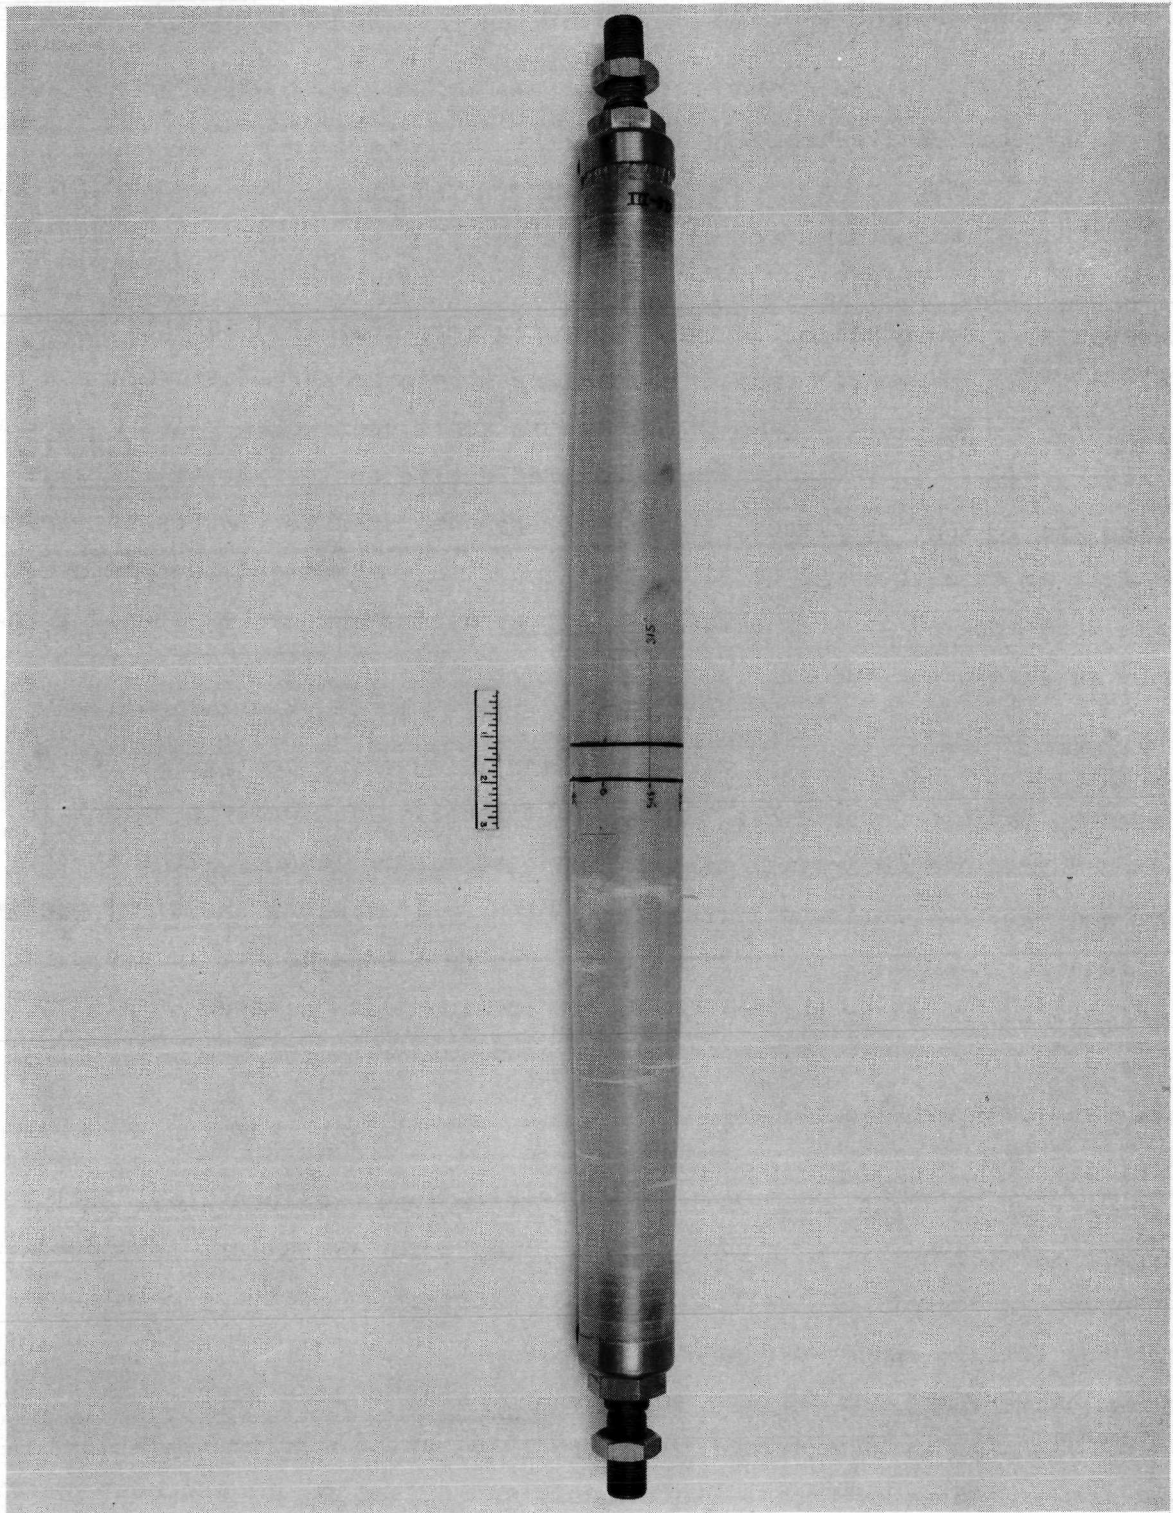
Specimen III-3D After Failure in Cyclic Loading
